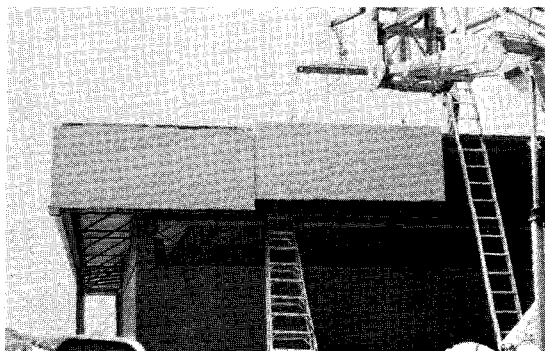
shows GRC panels being installed as permanent formwork for a road bridge deck. The bridge spanned a river which made it difficult to provide support for removable formwork and permanent GRC formwork proved to be the most cost effective solution. The unsupported span was 4 ft 6 in., the load due to wet concrete and live loads was taken as being 140 lbs per sq ft and the deflection limitation was $\frac{1}{75}$ times the span. The GRC panel
